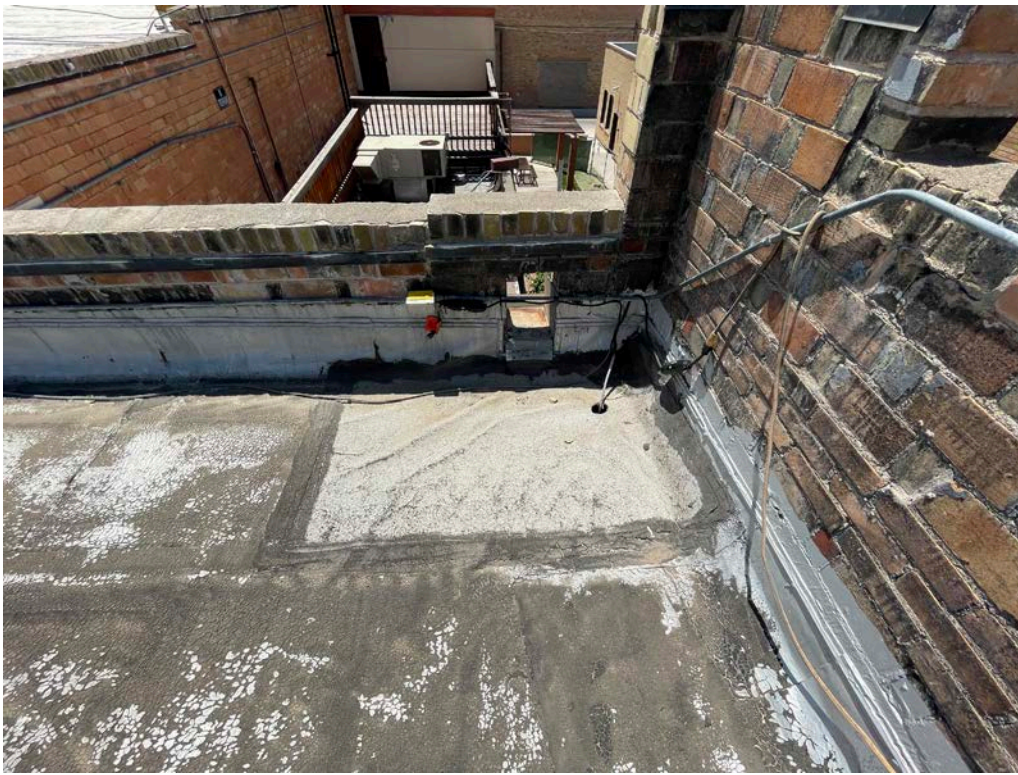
Northwestern corner of second story roof, backside of roof scupper. Roof drain is small hole with heat tape. Center right of picture. This appears to drain the entire 1927 section of second story roof. Western section of roof over 2 story, drains to the west.
